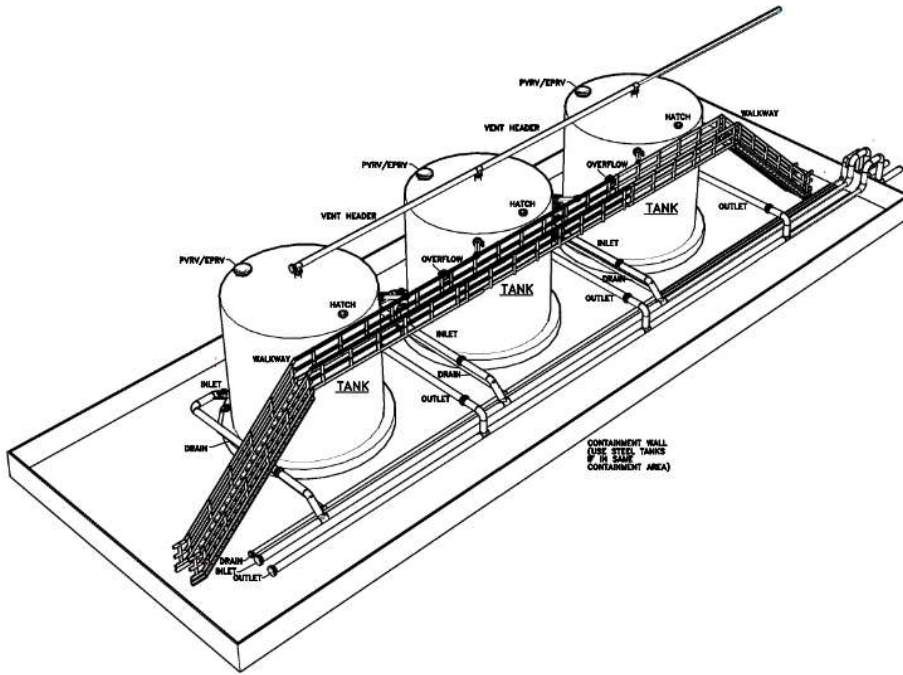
Example of Straight-line Tank Battery Installation and Piping Configurations
